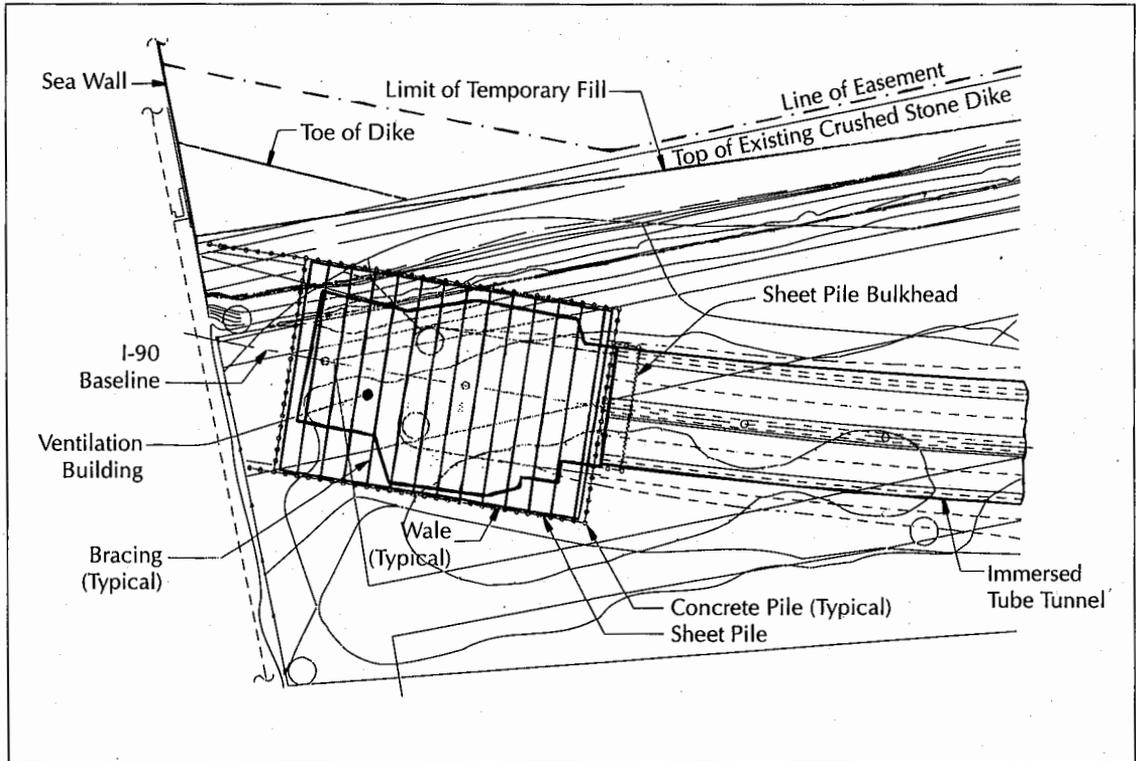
Another option using concrete-filled pipe anchor piles with sheet piling.
